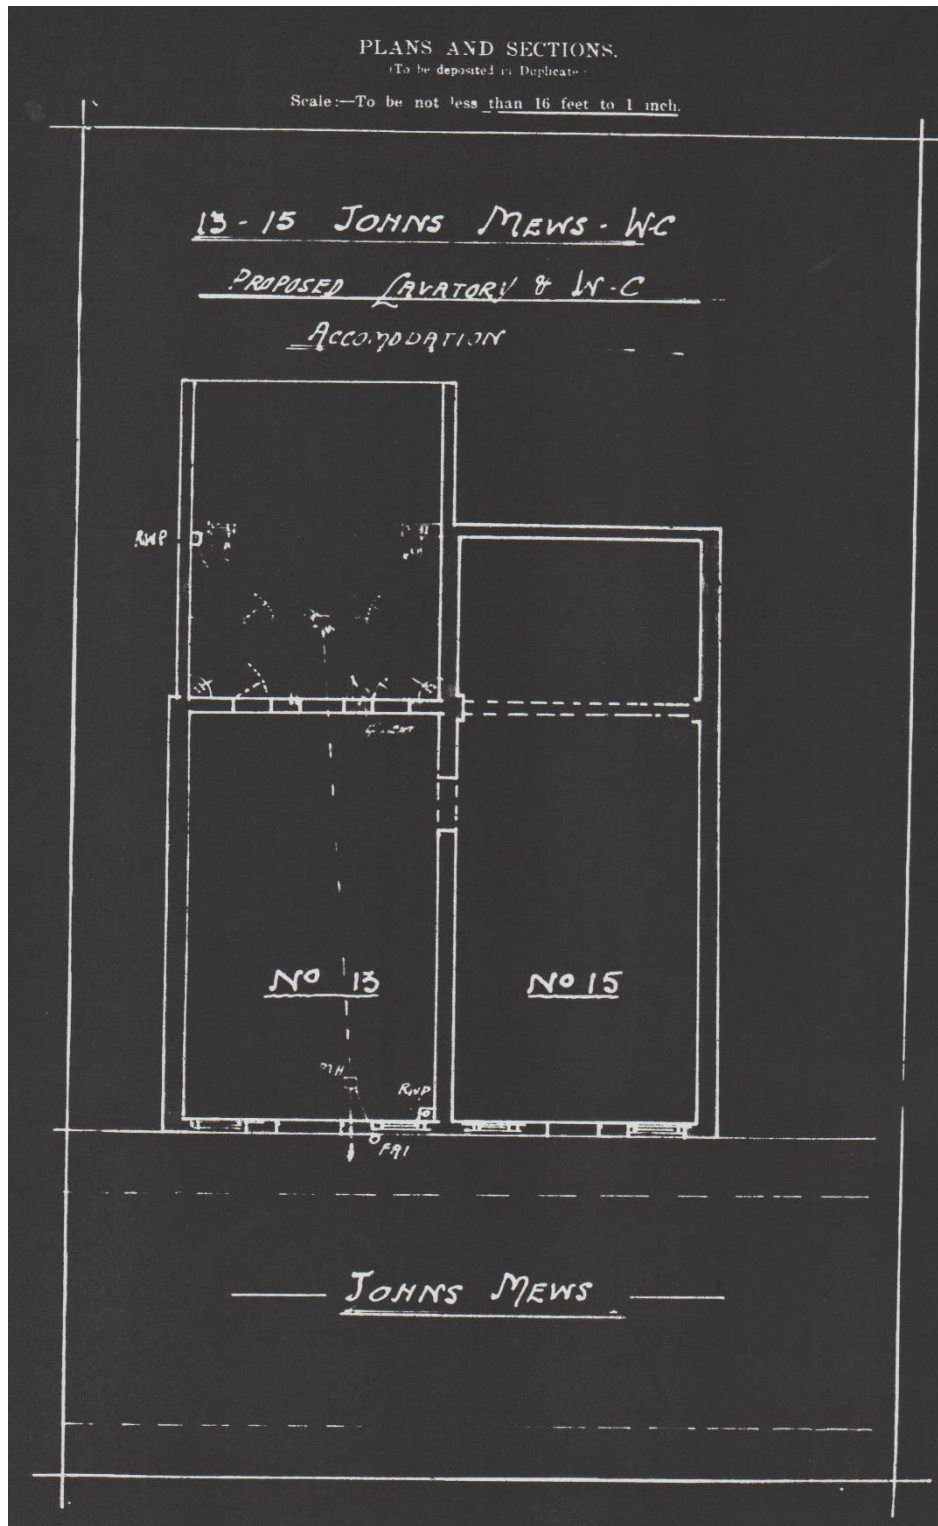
A plan of 13-15 Johns Mews in 1921, apparently at first floor level.
